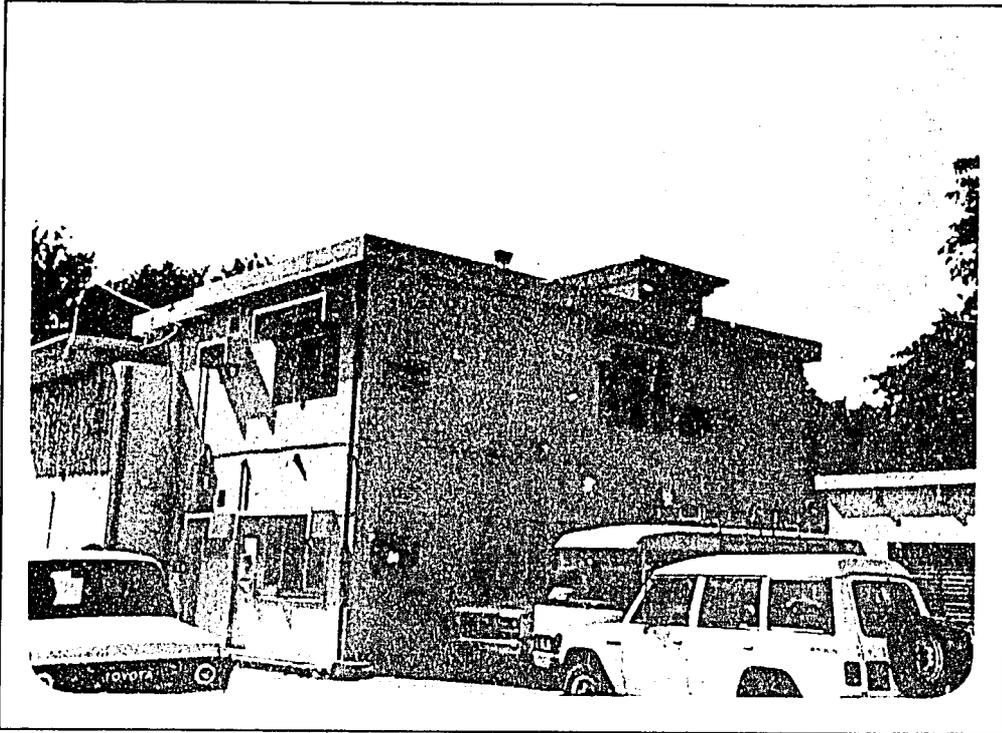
Peshawar AID/Rep Office Facility. Main Office Building (facing South Southwest), referred to as Building No.1.
